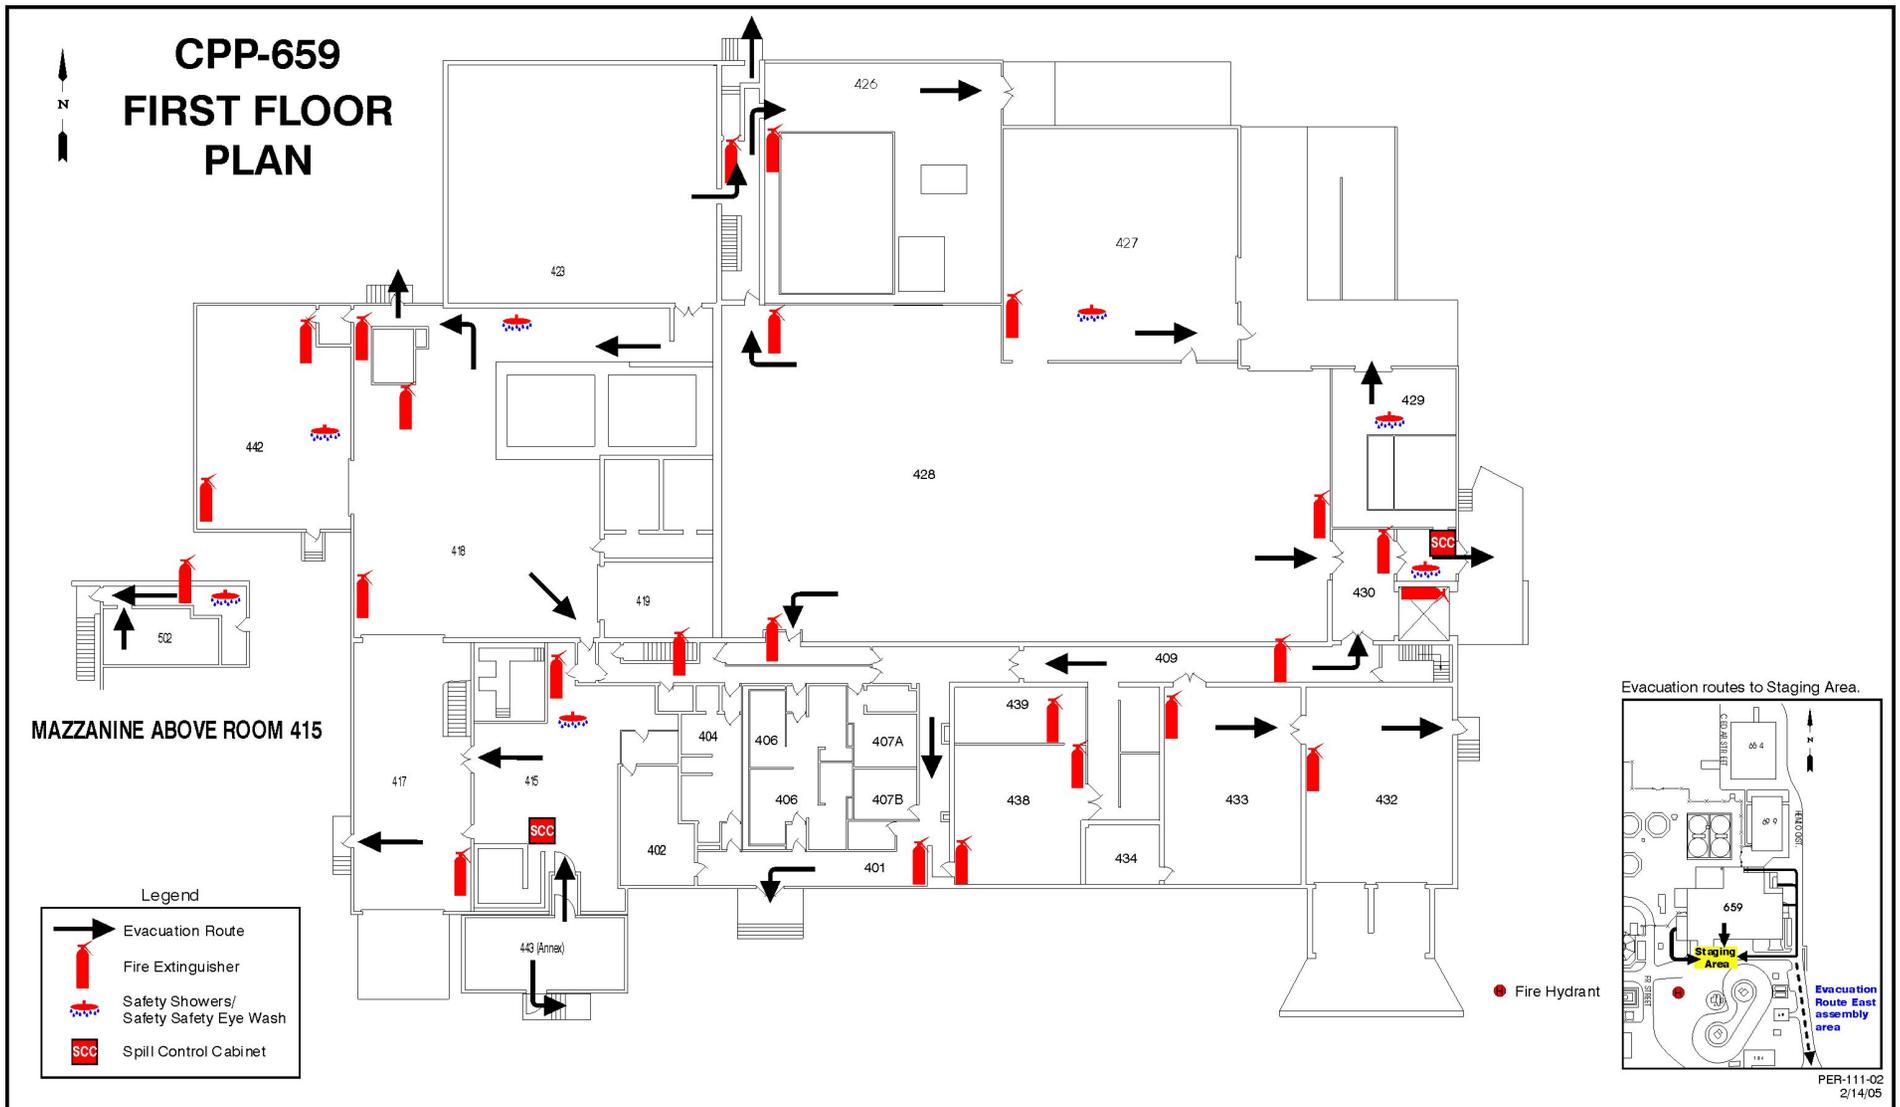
Evacuation Routes and Emergency Equipment, CPP-659 First Floor
